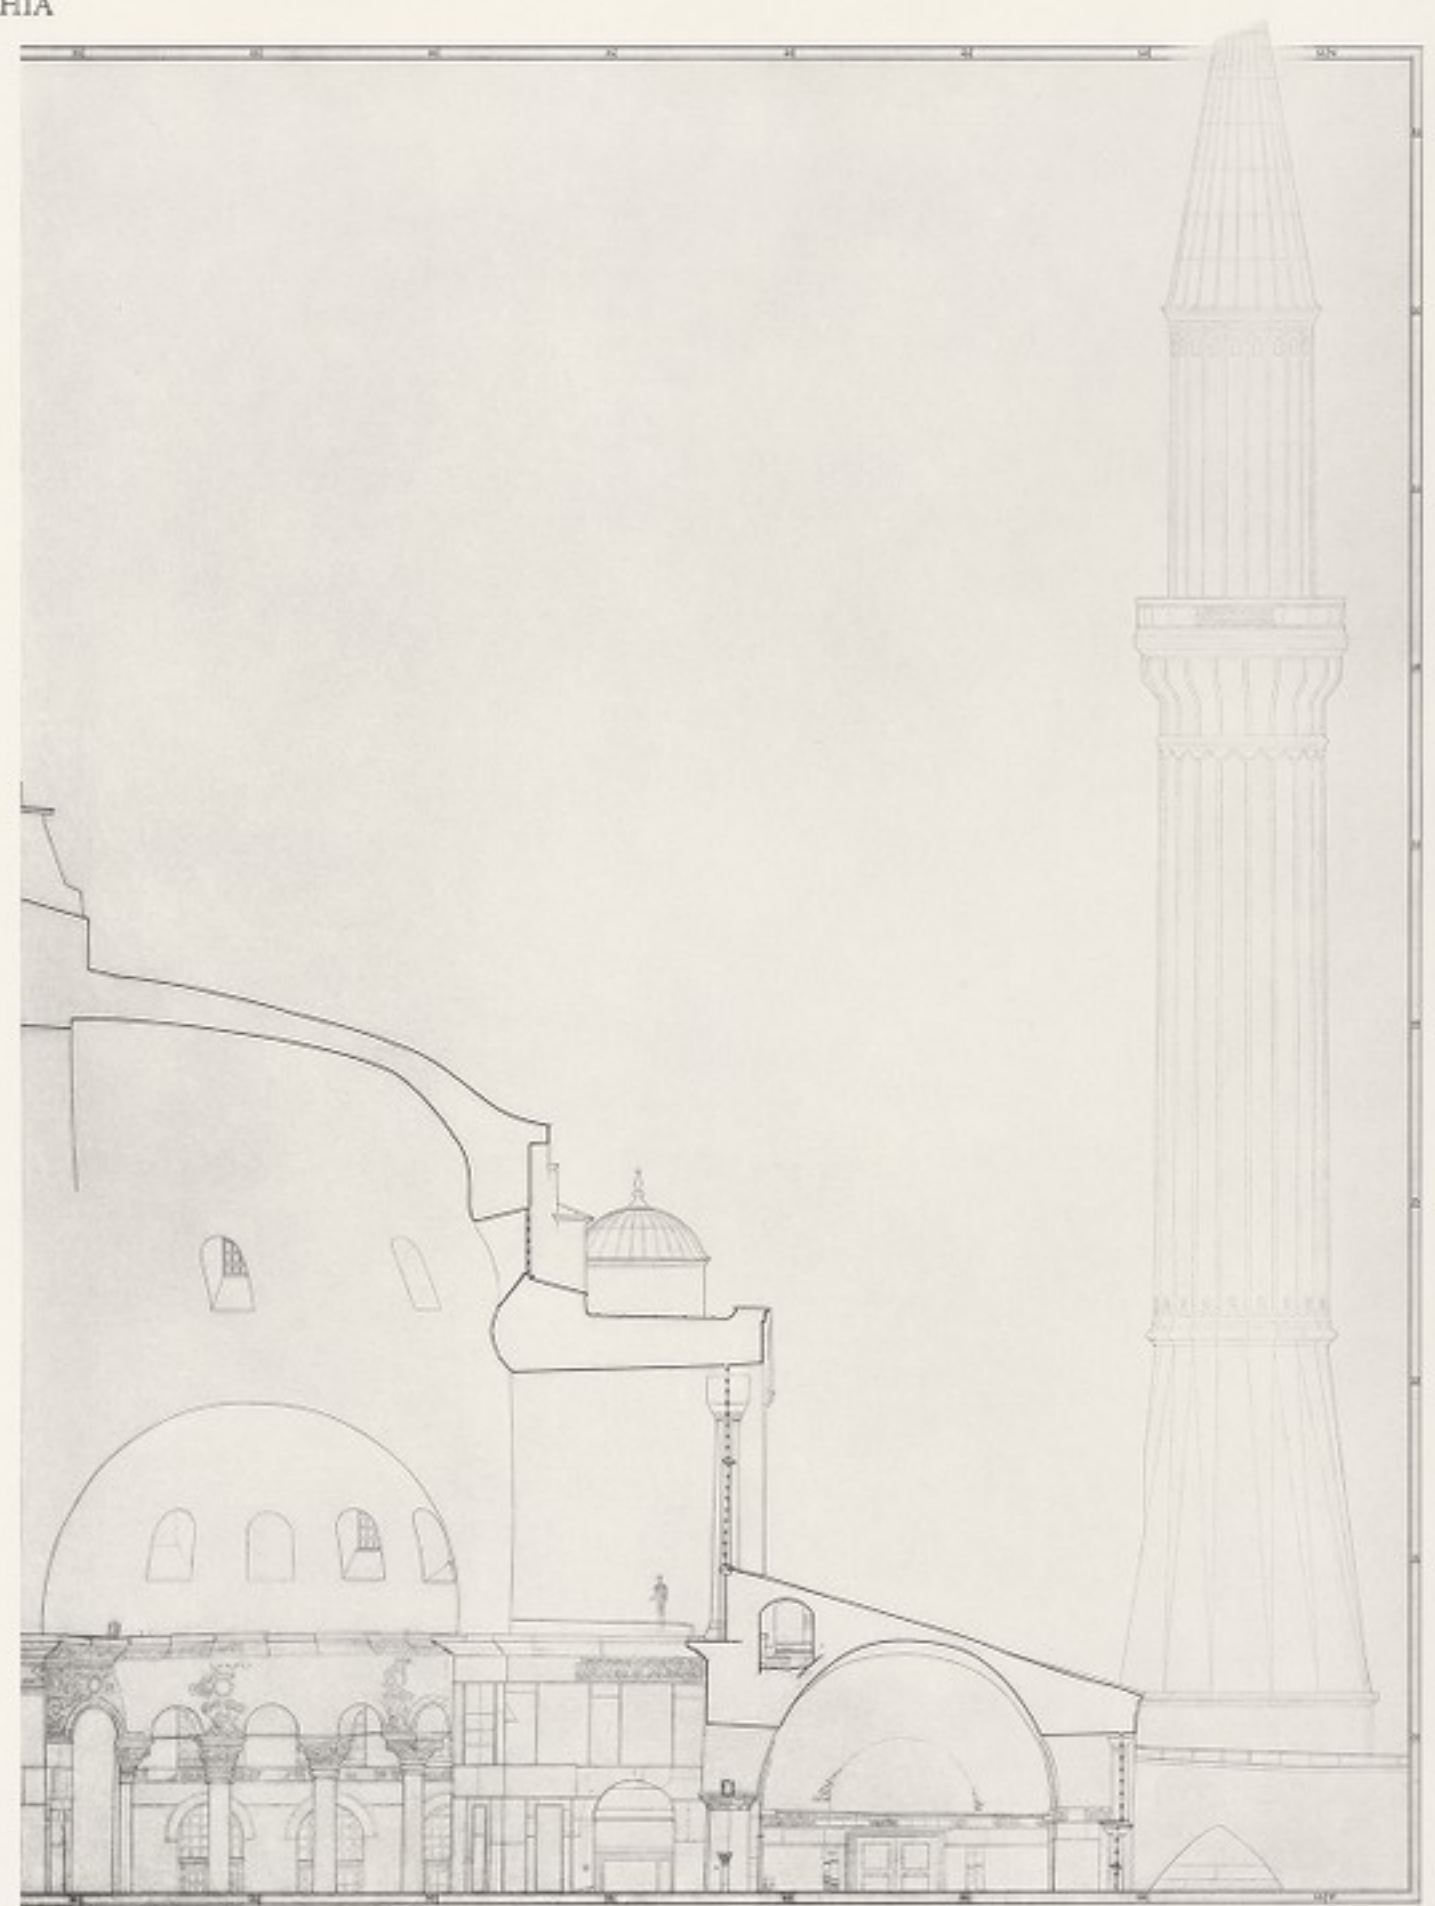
B. LONGITUDINAL SECTION, LOOKING SOUTH
